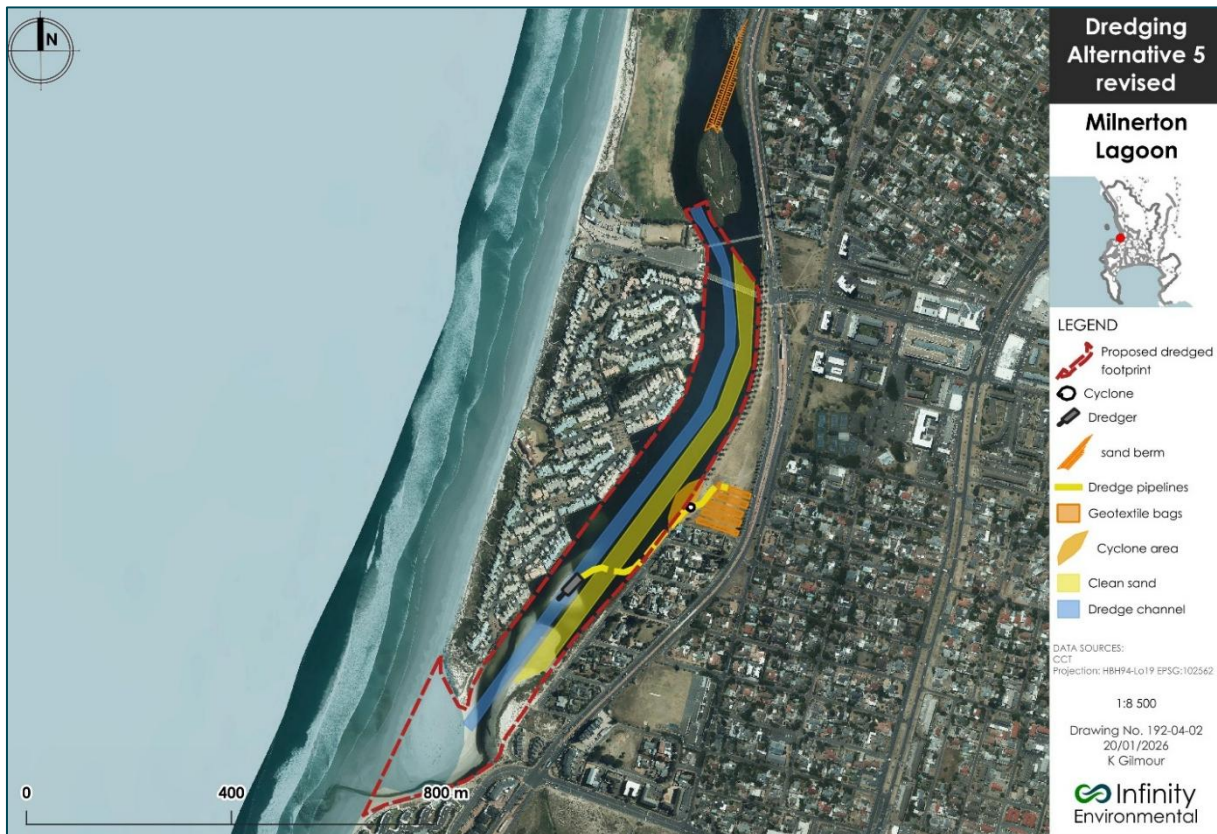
Design and layout Alternative 5 – the proposed dredging with off-site disposal.
